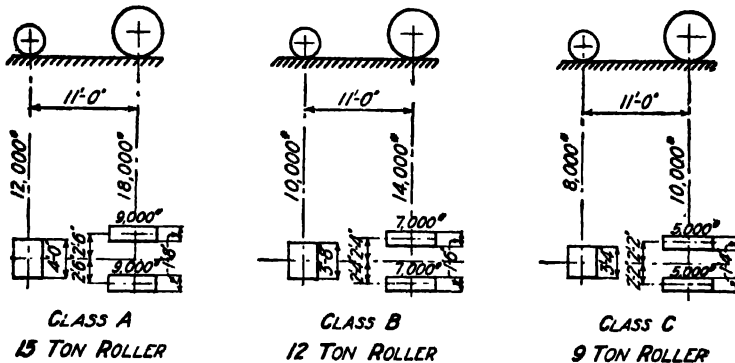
Road Roller and Motor Truck Loadings for Highway Bridges
